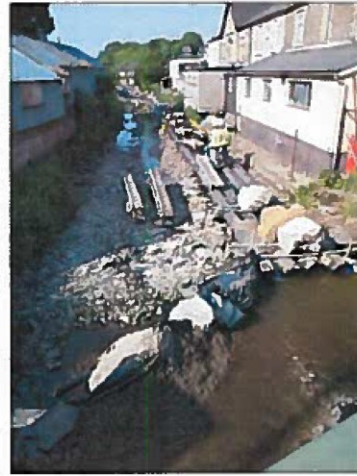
Damming and diverting of river by bridge in preparation for dredging. Looking south from bridge.
